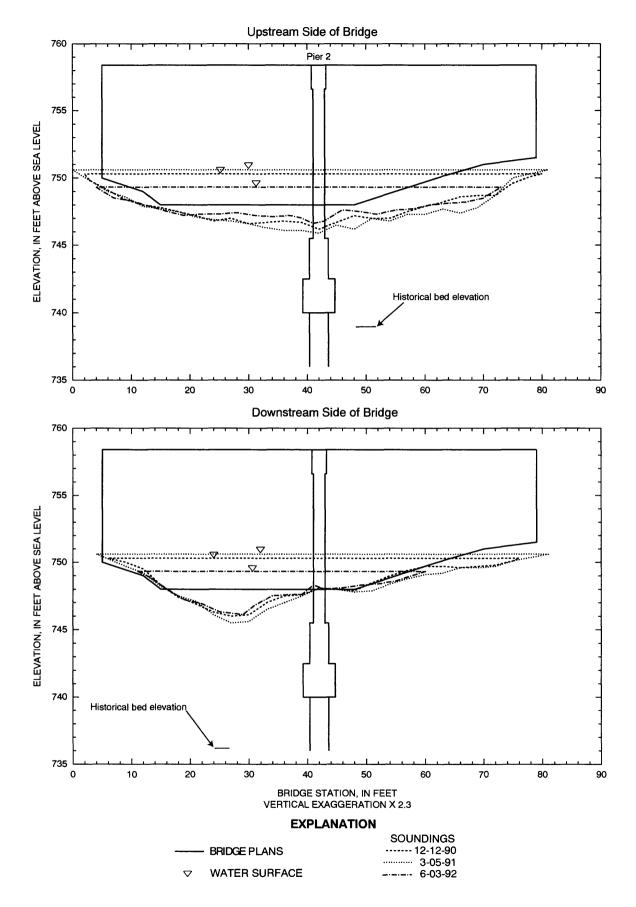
Cross sections showing bed elevations from bridge plans and soundings, State Road 15 over Little Elkhart River at Bristol, Indiana.
